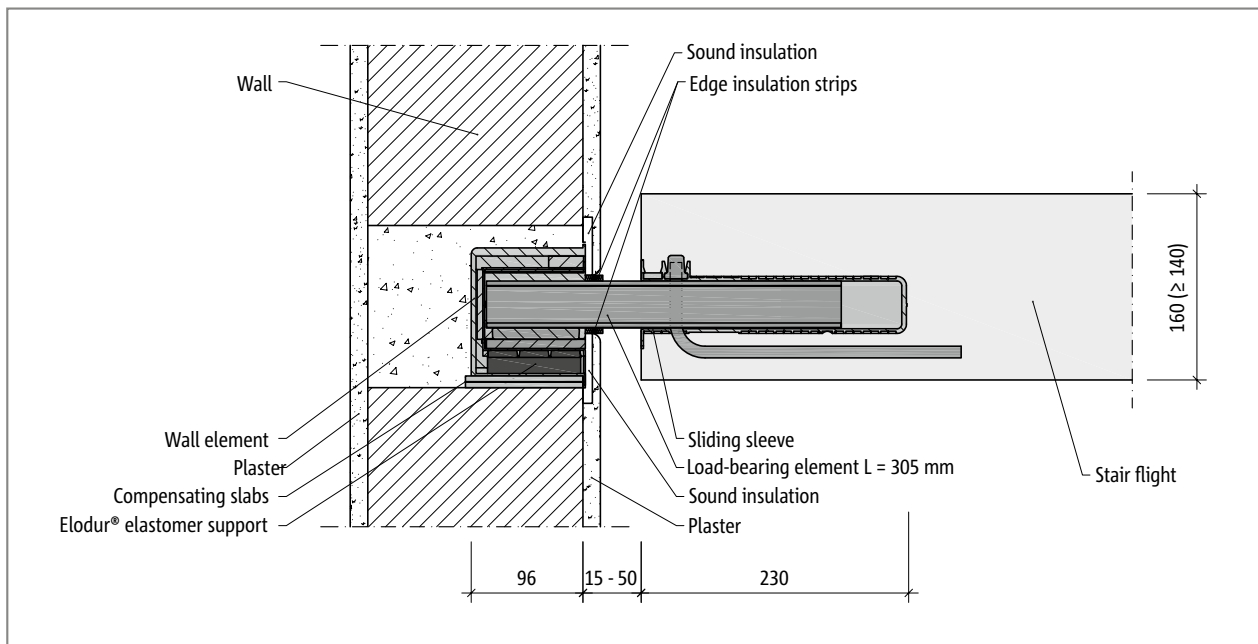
Schöck Tronsole® type Q-FV or Q-A2: Installation cross-section with precast stairs flight
